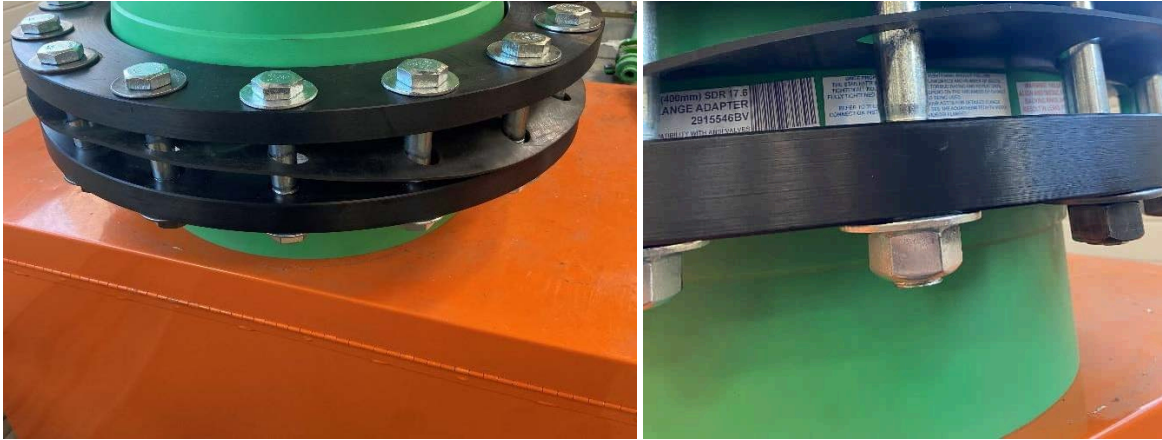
Photos of installed bolt/nut/washers on new rings using Aquatherm flange-to-flange and 1/8-in EPDM gasket
